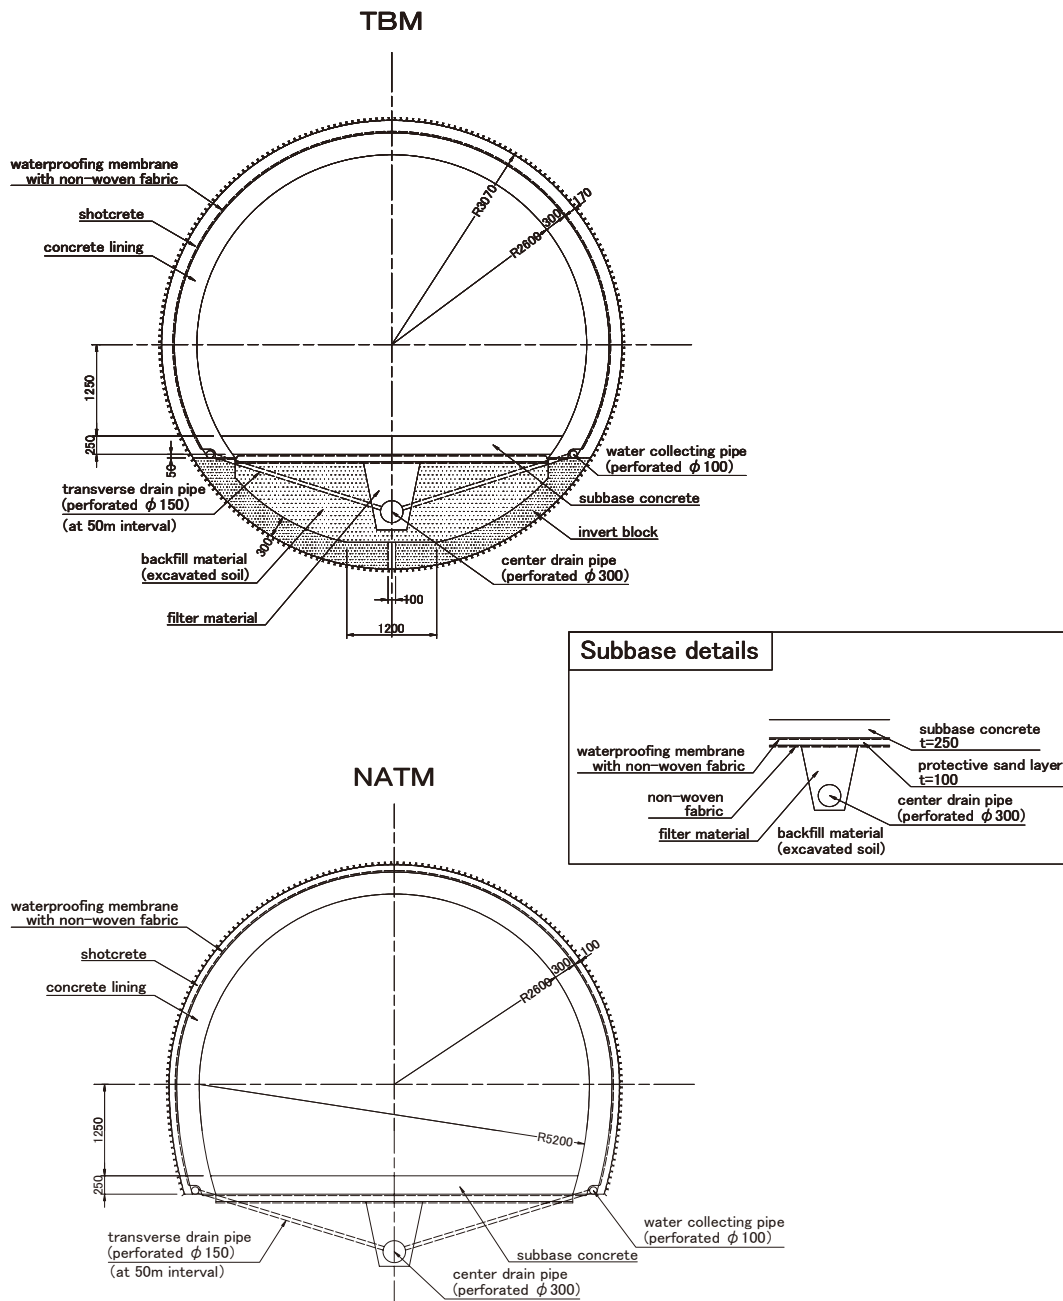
Standard constructions for the MLT waterproofing and water drainage
